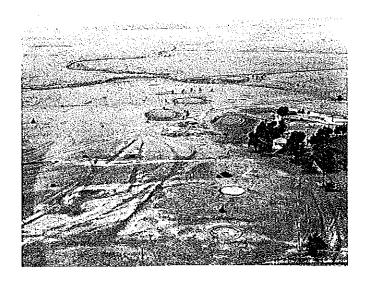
Completed Coal House Excavation (7/30/1970),
